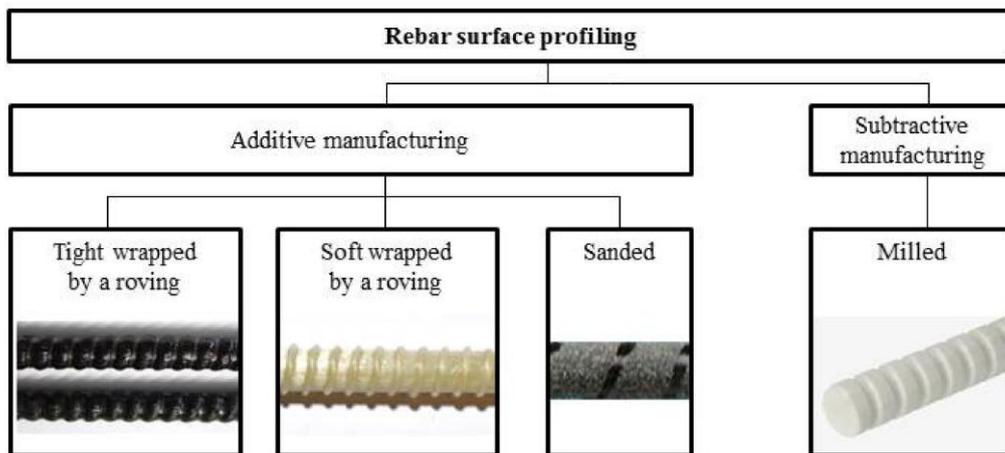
Different profiling methods used in FRP bars to improve bonding behaviour in concrete[107].
